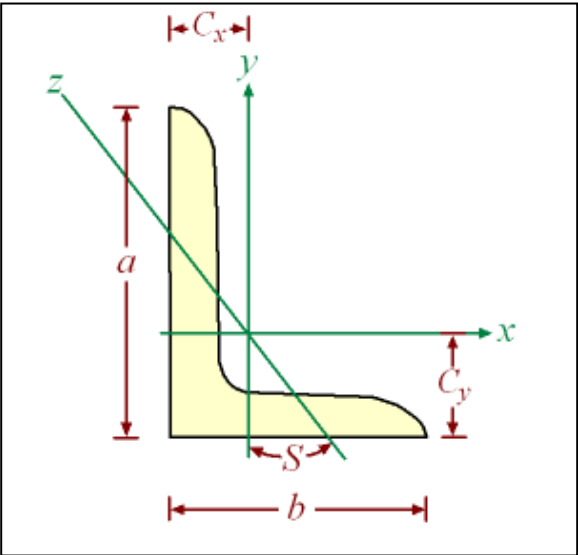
Steel angle (L-shape) cross sectional with dimension.
